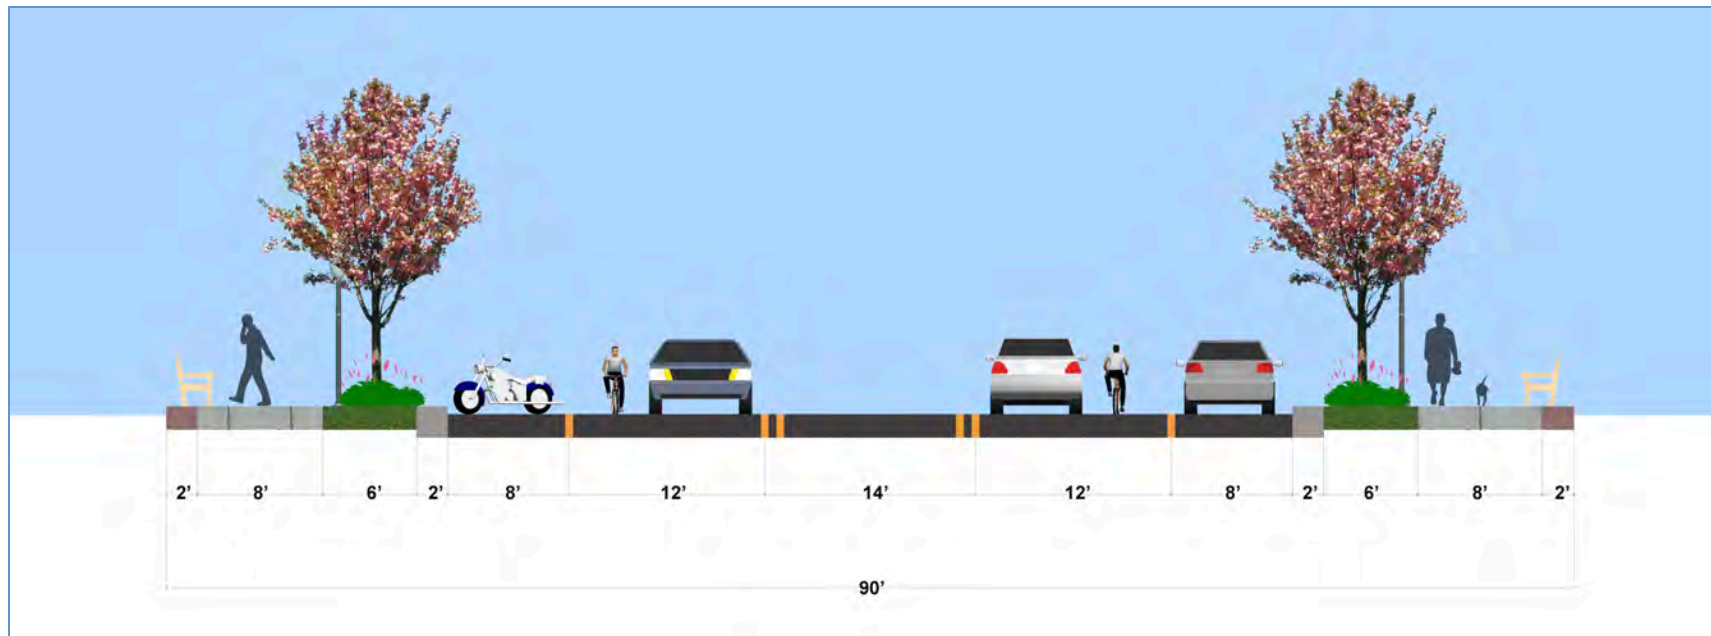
Image of typical T-5 Transect Zone/Urban Center Zone Arterial Streetscape with planting are within an amenity zone and street furnishings to the outside.
